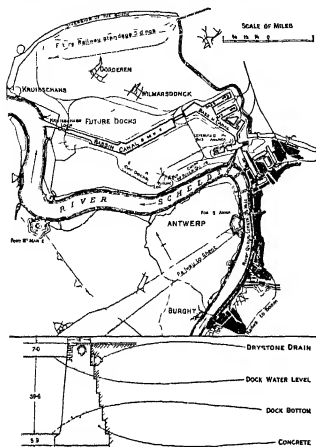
GENERAL PLAN OF THE PORT OF ANTWERP, BELG. AND INSET OF A TYPICAL CROSS SECTION OF THE QUAY WALLS IN THE BASIN CANAL.
